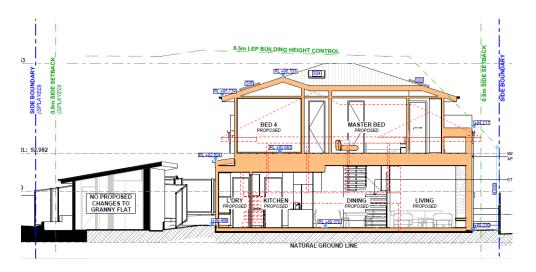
Plan Extract: Cross Section illustrating building envelope.
